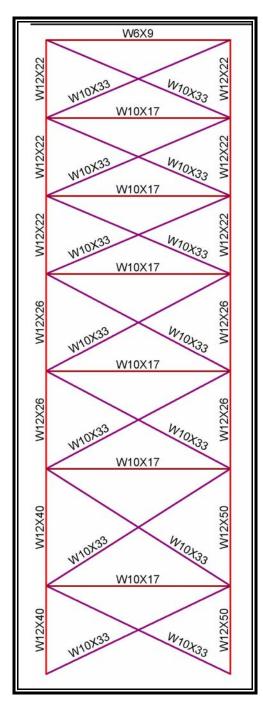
Elevation View of a Typical Lateral Frame including Member Sizes
